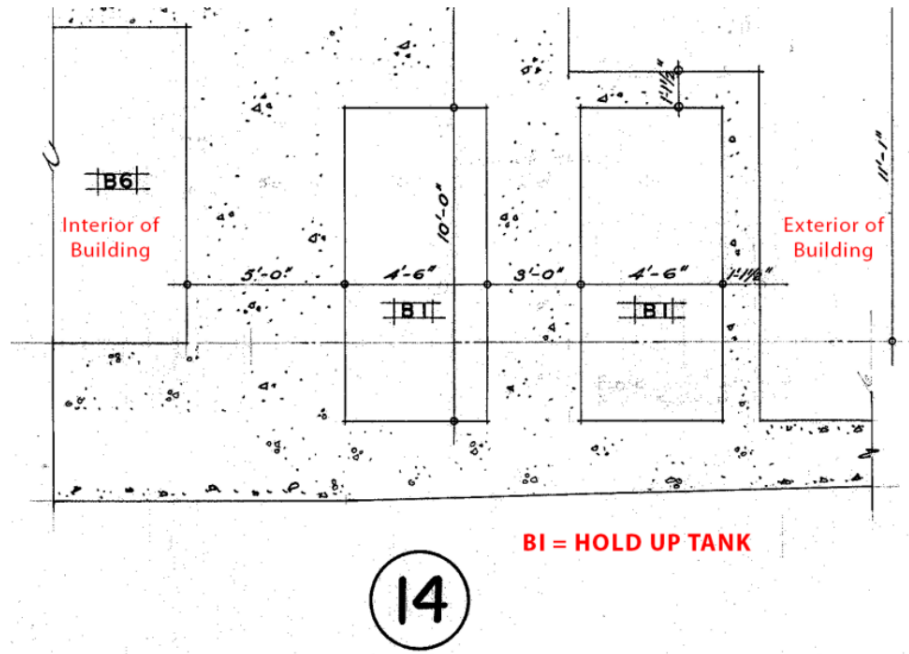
Cross section of the HUT showing concrete wall thickness.
